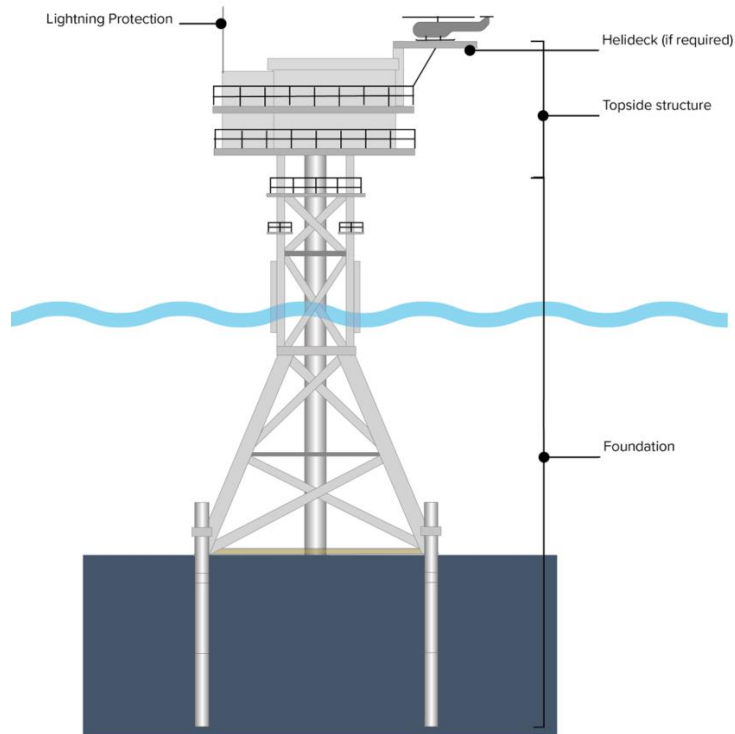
Schematic of an OSP. Note: The schematic shows a 'jacket on pin piles' foundation, however, the actual foundation type may differ e.g. monopile.
